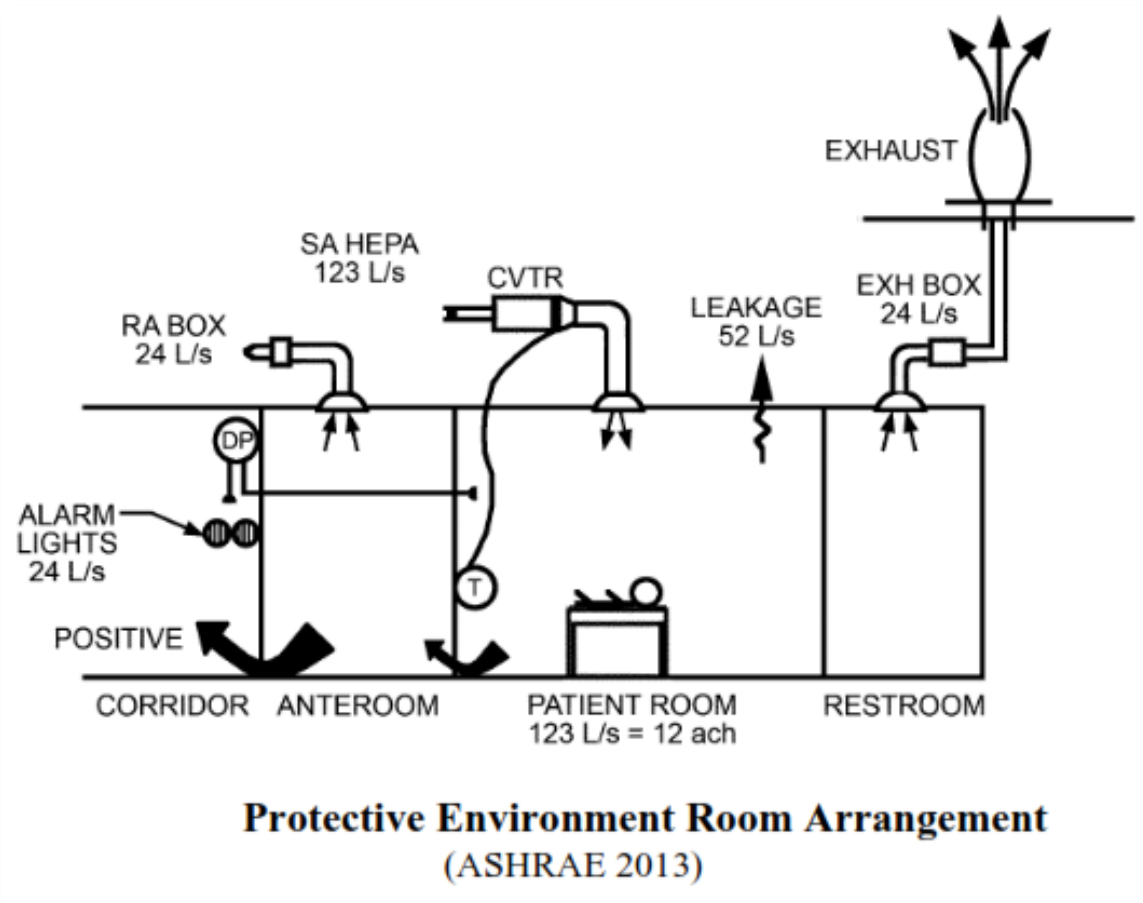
Typical HVAC system room arrangement for *all* room taken from ASHRAE Handbook 2019 HVAC Applications - Chapter 9 Healthcare Facilities
